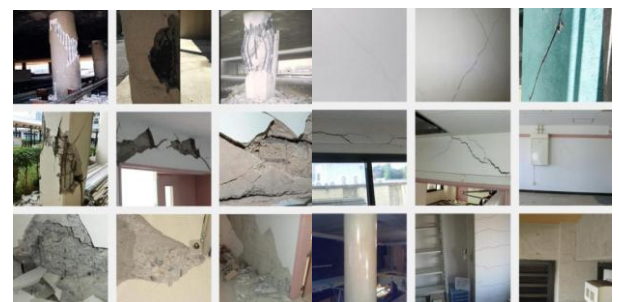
Specific examples of spalling (left) and non-spalling (right) images
